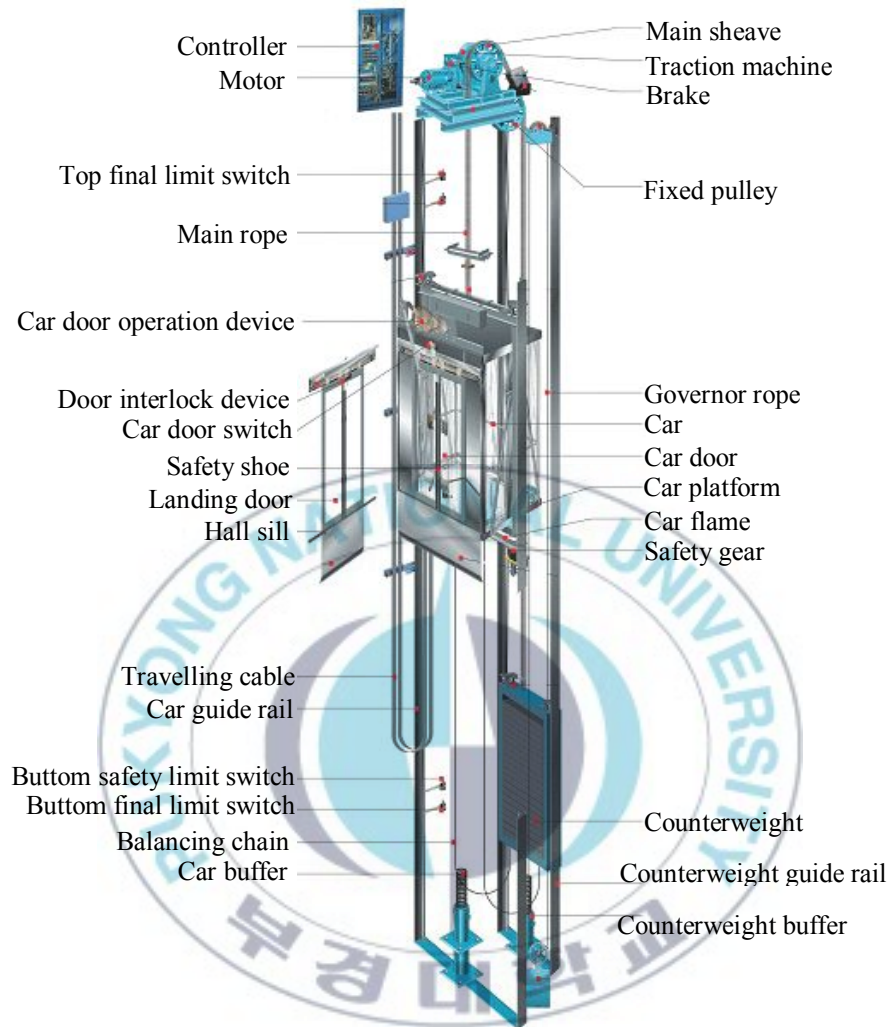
Rope type elevator [1] (adopted from Dong Yang Elevator Co.,Ltd.).
